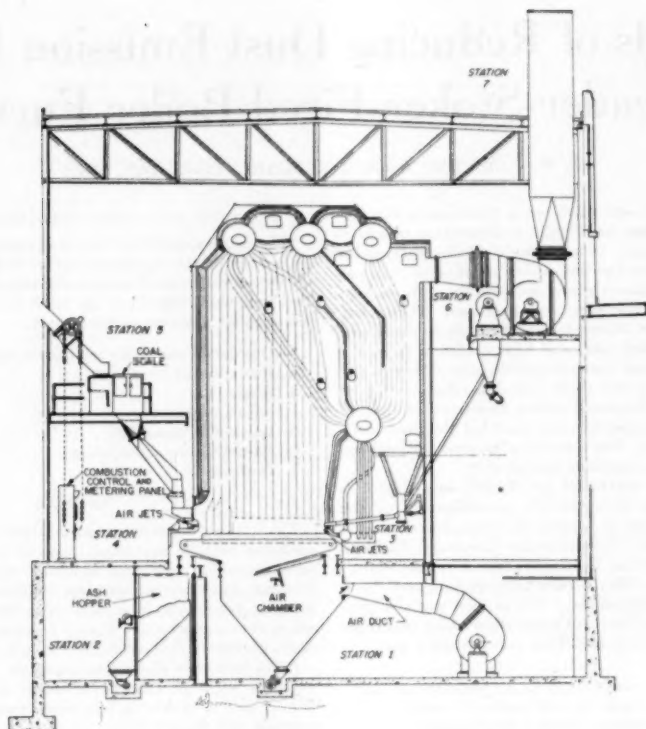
SIDE ELEVATION OF BOILER TEST PLANT
